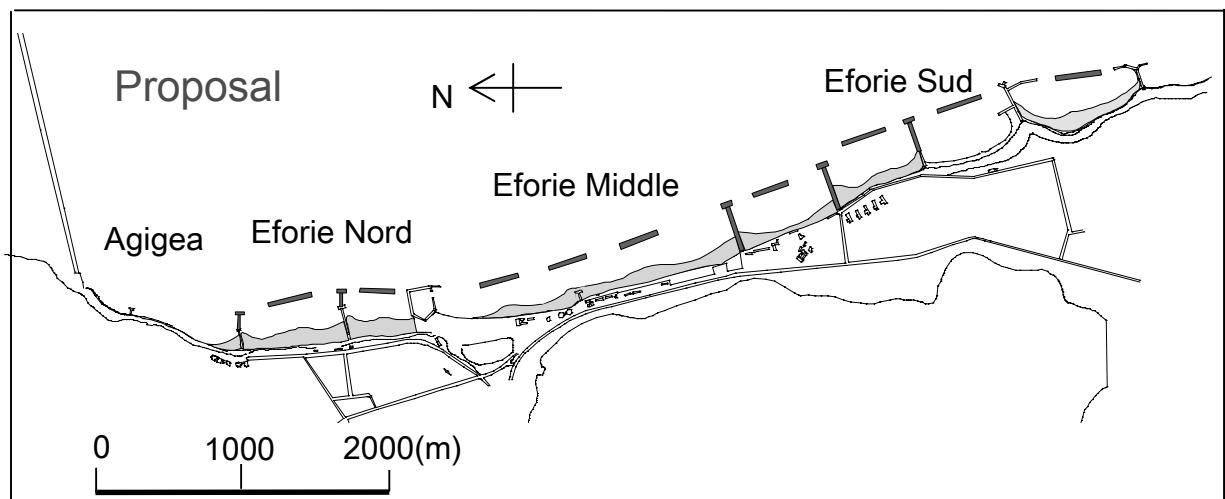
Proposed shore protection facilities at Eforie Sector
